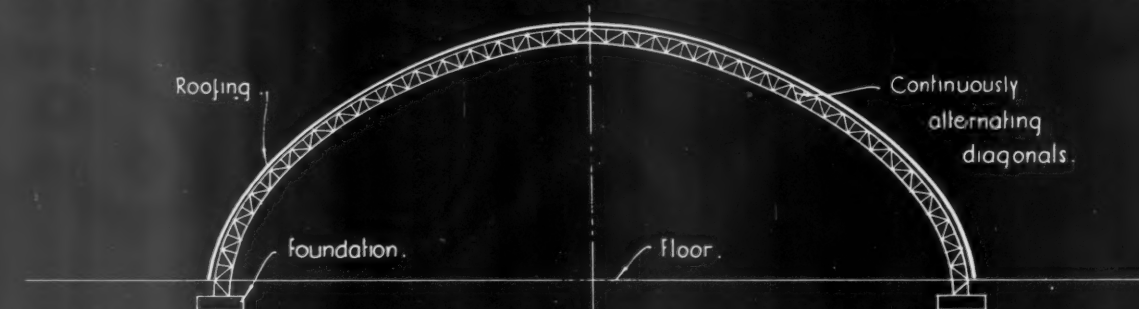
ARRANGEMENT OF ARCHED LATTICE CONSTRUCTION FOR WIDE SPANS.
